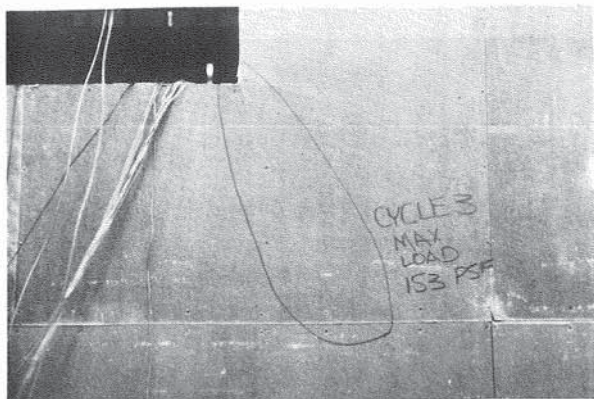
Failure of gypsum sheathing at first story window opening at sill-jamb juncture. (Crack typical at several locations.)
